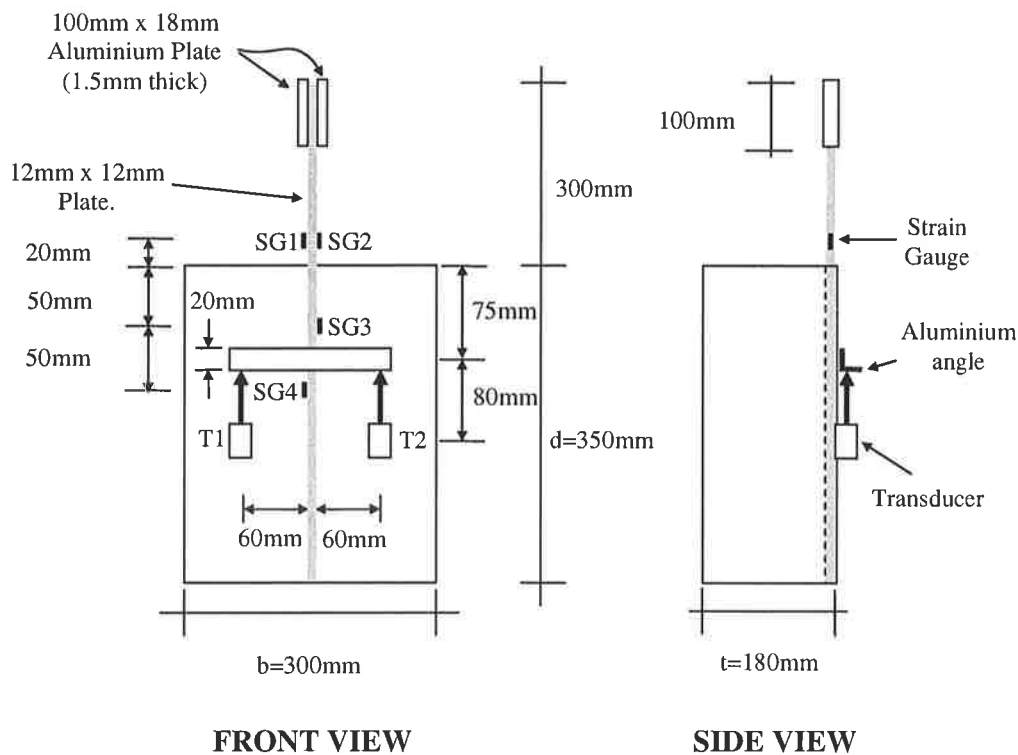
Pull test of 12mm x 12 mm Mild Steel and Aluminium plate details.
